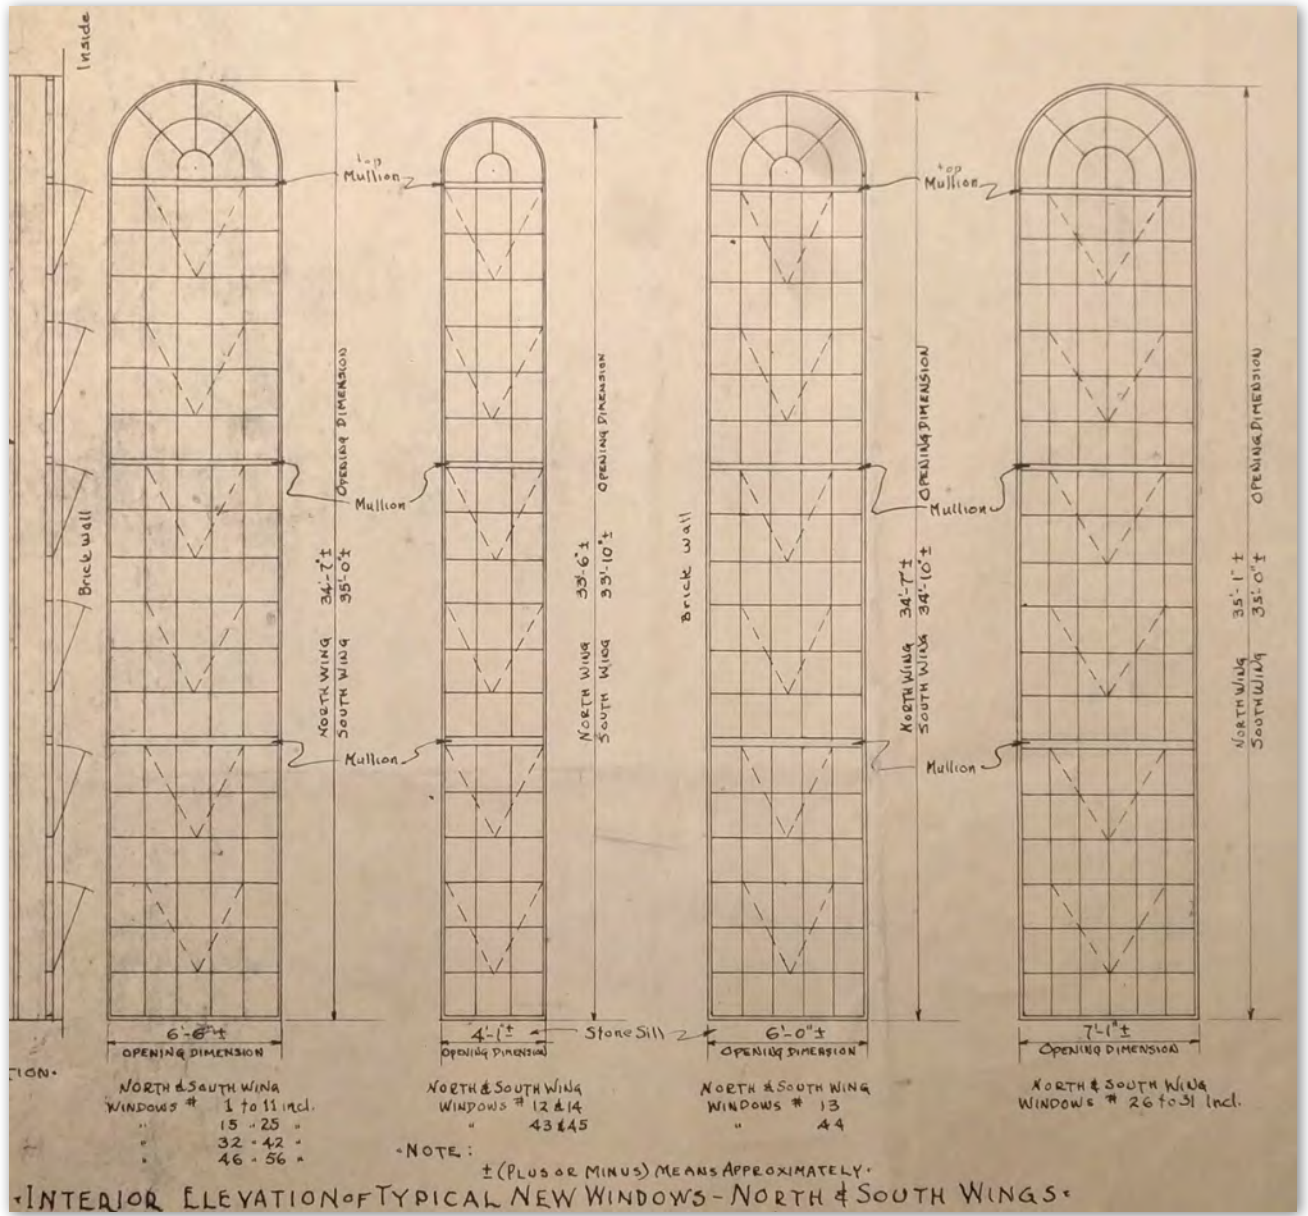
Excerpt from an architectural drawing from 1937 showing window replacement details and dimensions. The section drawing (left) and the dashed V-shaped lines on each window show the location of the six operable hopper windows (SCI-Pittsburgh Facilities Archives).
